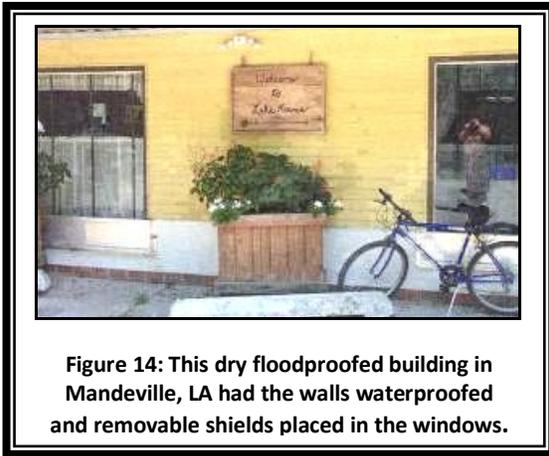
This dry floodproofed building in Mandeville, LA had the walls waterproofed and removable shields placed in the windows.
